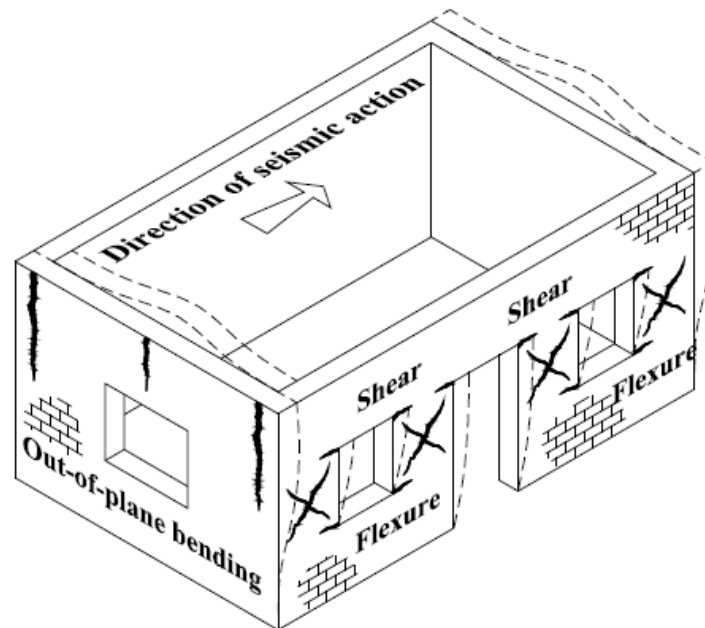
Box-behavior of masonry building including out-of-plane and in-plane walls (Alejo et al., [2017](#))
